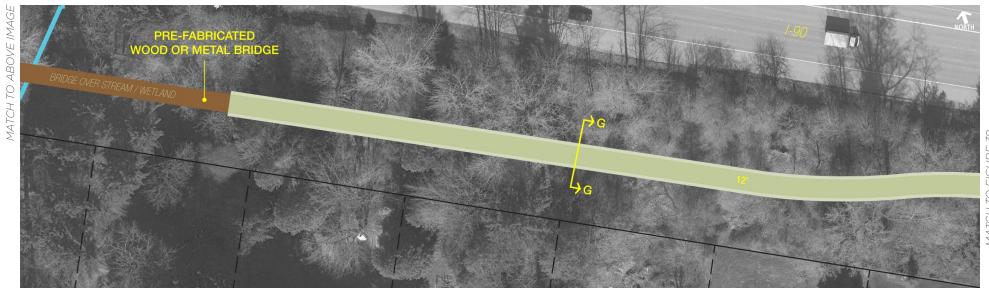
Trail in undeveloped WSDOT right of way east of 164th Ave SE.
